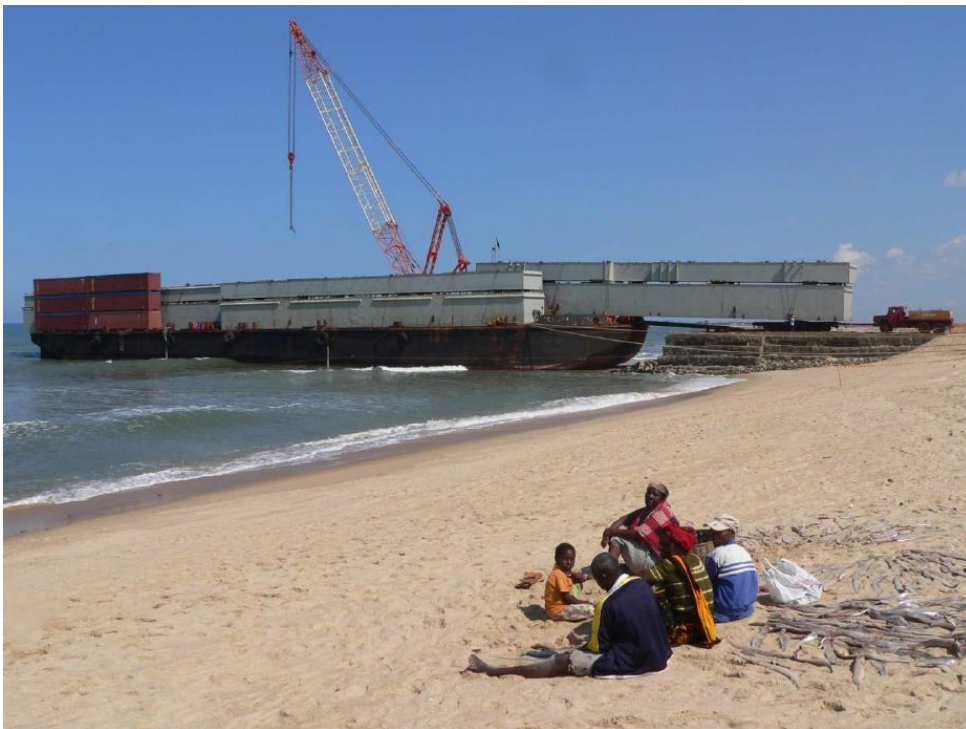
Typical beach landing site with barge offloading heavy equipment (source: Comarco)
